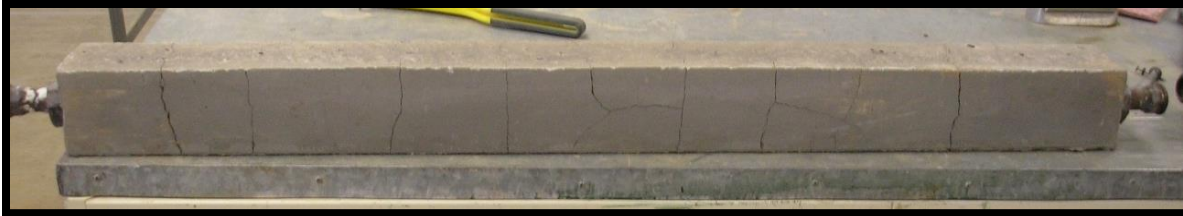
Cracking of Concrete during Testing of Passive Storage Concept
